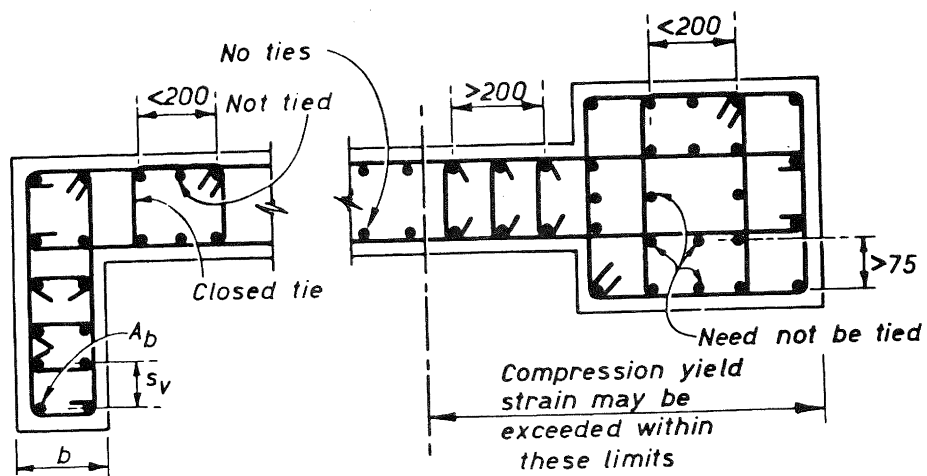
Details of Transverse Reinforcement in Potential Plastic Hinge Region of Cantilever Shear Wall (from Commentary of NZS 3101)
